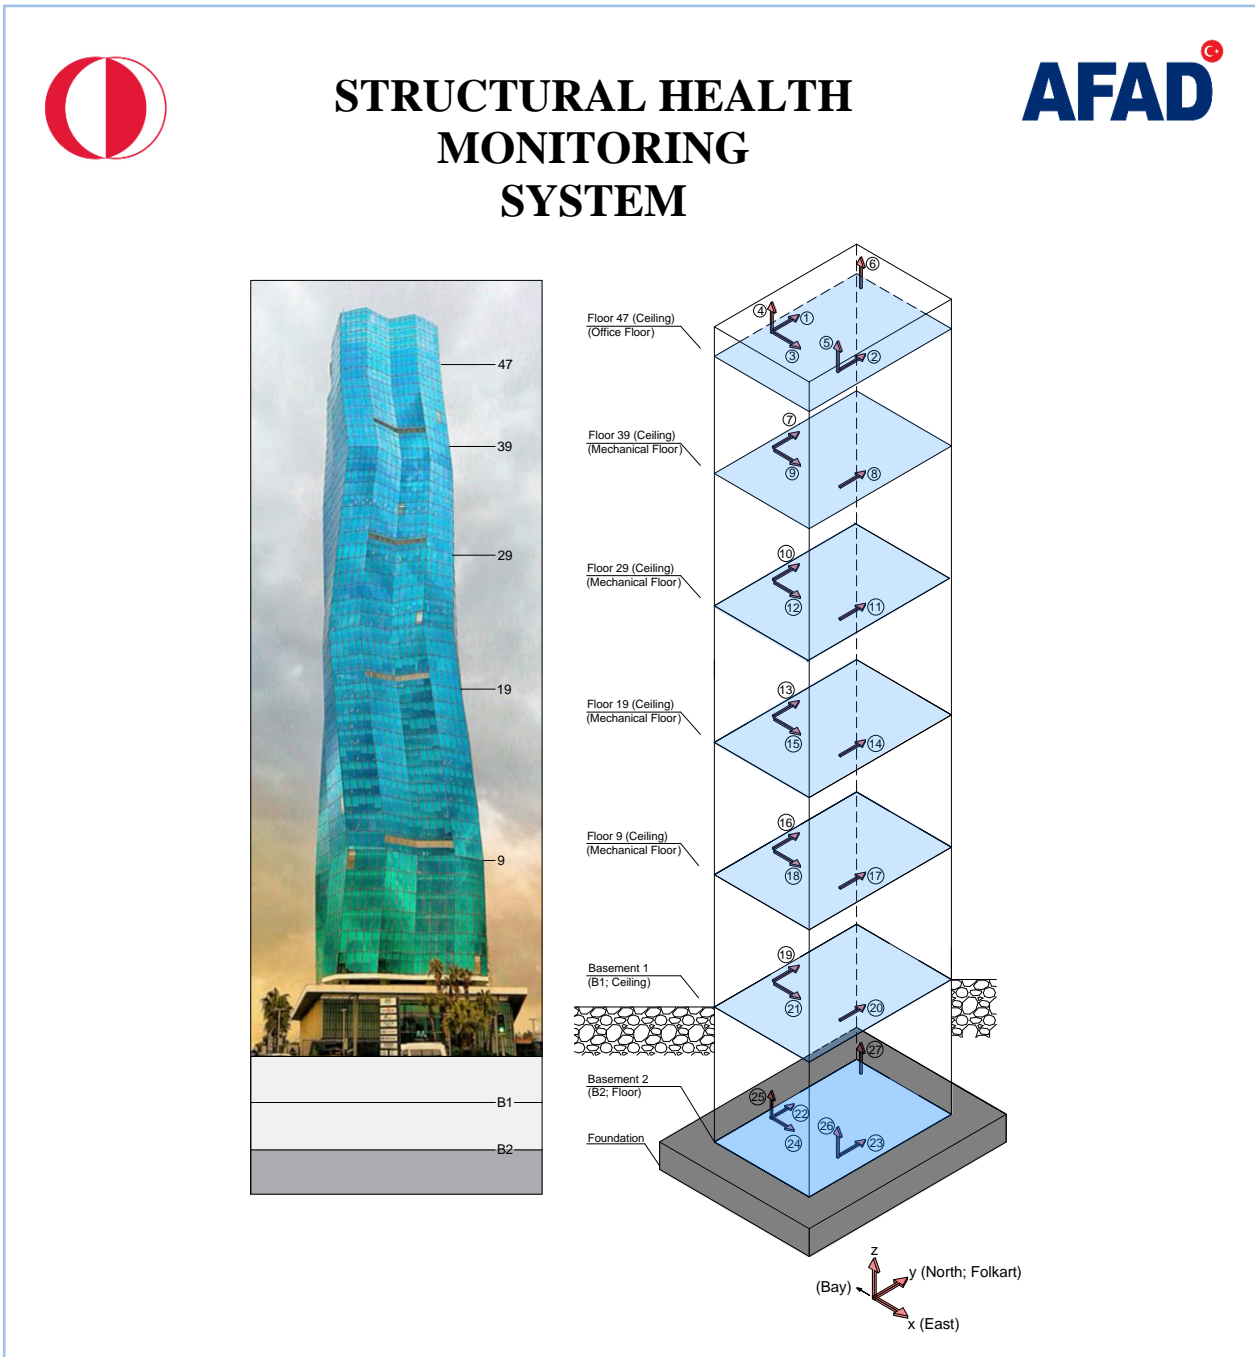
The building in İzmir and the floors that the structural health monitoring system was installed
